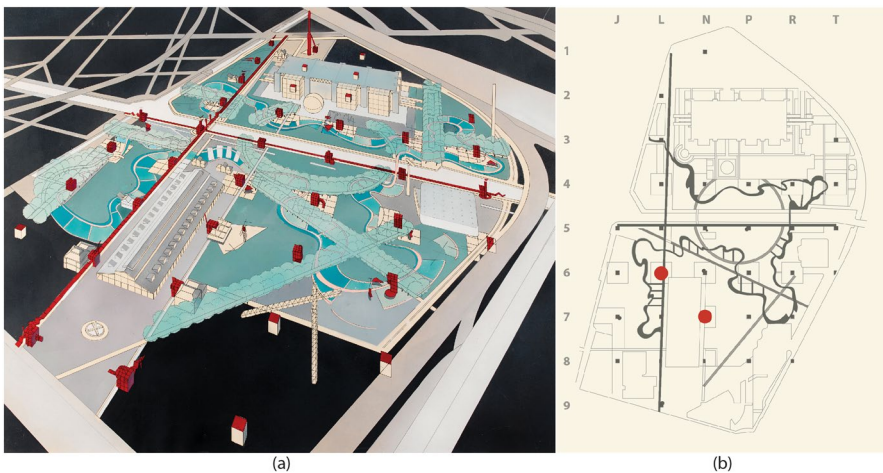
Global layout of the Parc de la Villette, Paris. (a) Aerial Perspective (© Bernard Tschumi Architects; authorized for publication). (b) Plan (Drawing by Author)
